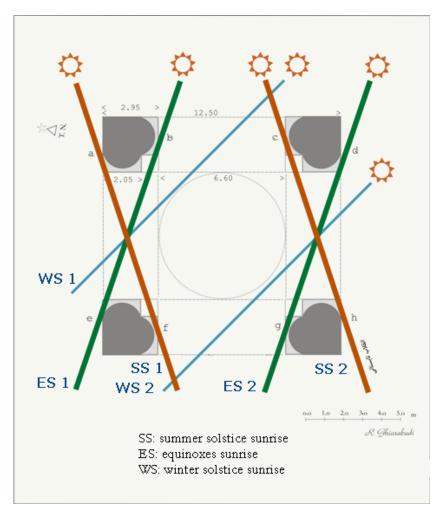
The floor plan and sightlines of Botkhaneh Tetrapylon
